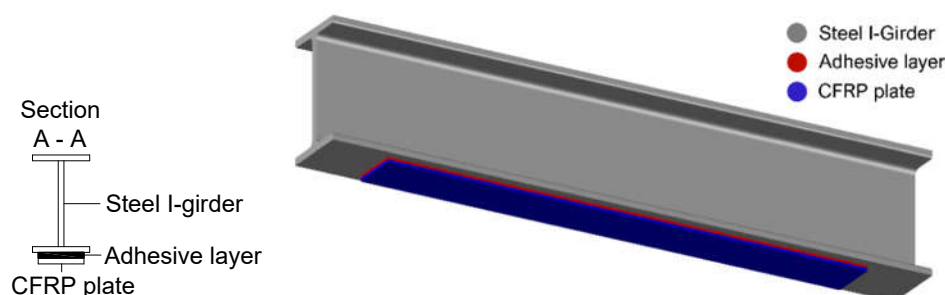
A typical sample of CFRP-reinforced steel I-girder.
